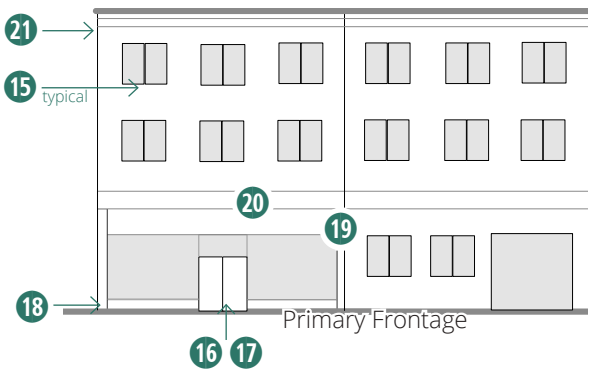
G-3. Workshop Building: Facade Design Requirements
